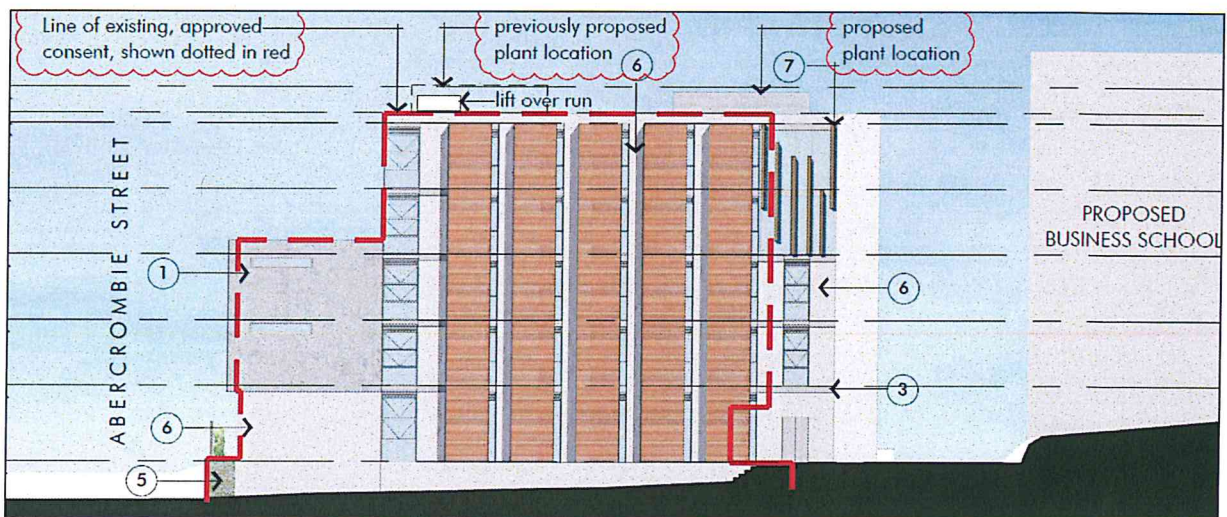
Proposed Eastern Elevation (approved outline shown in red)
